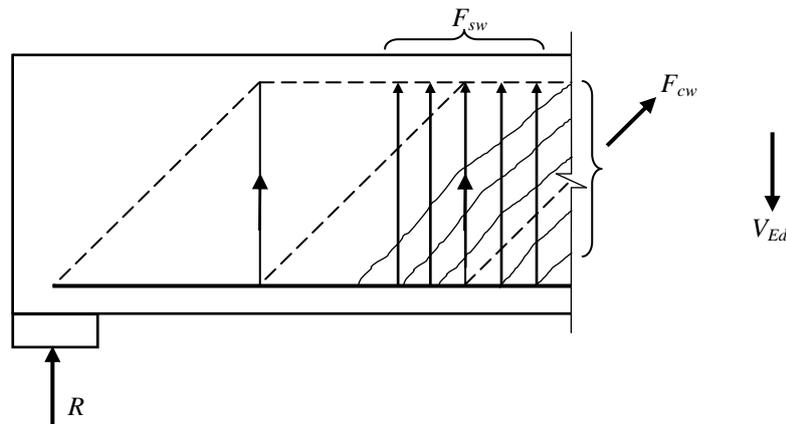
Truss model describing the load path for shear force along a concrete member cracked in shear. The angle of the stirrups is $\alpha = 90^\circ$.
